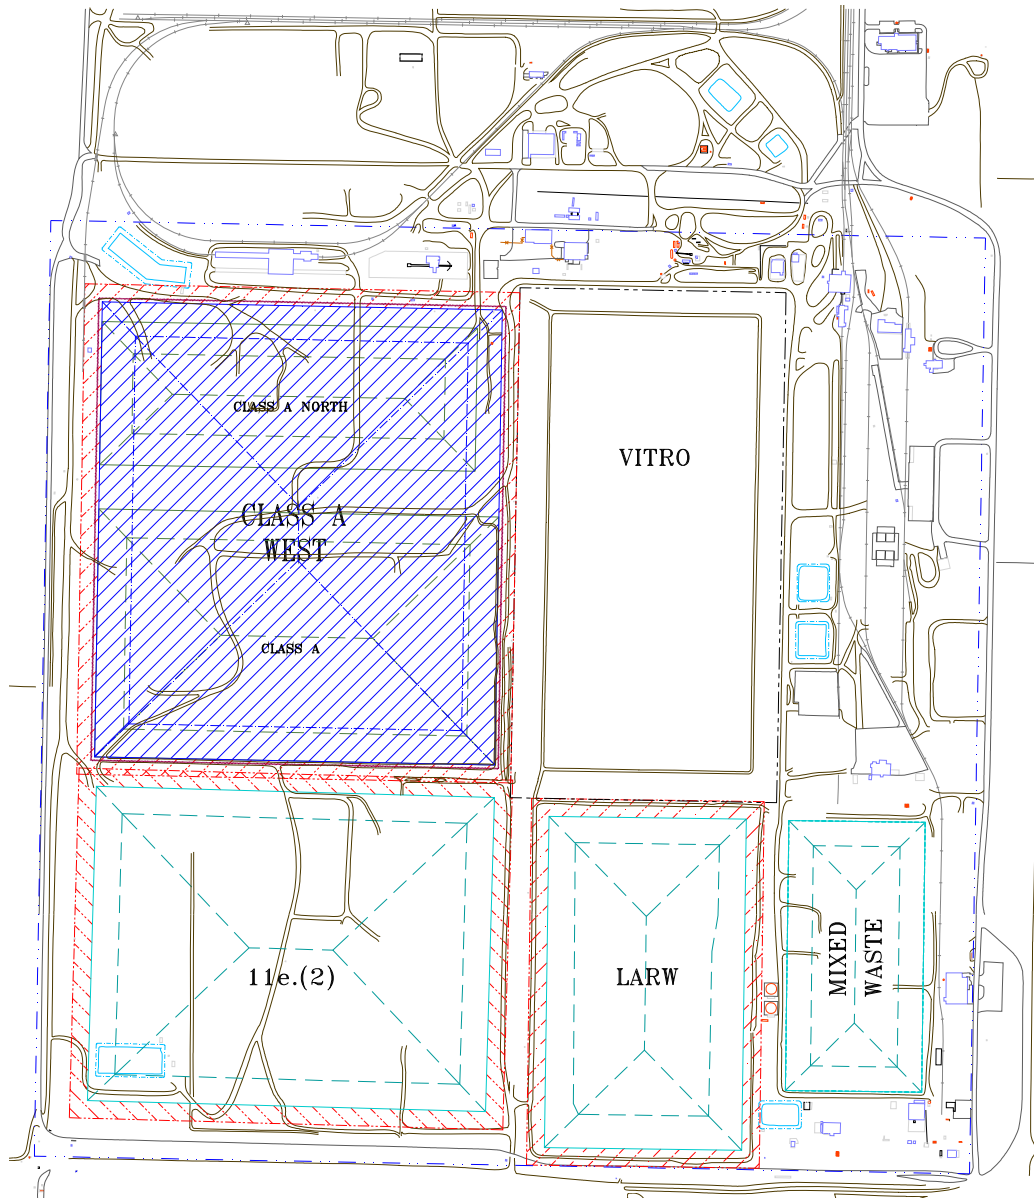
Plan View Map of Section 32 Showing Embankments, Buffer Zones, and Proposed Class A West Cell
